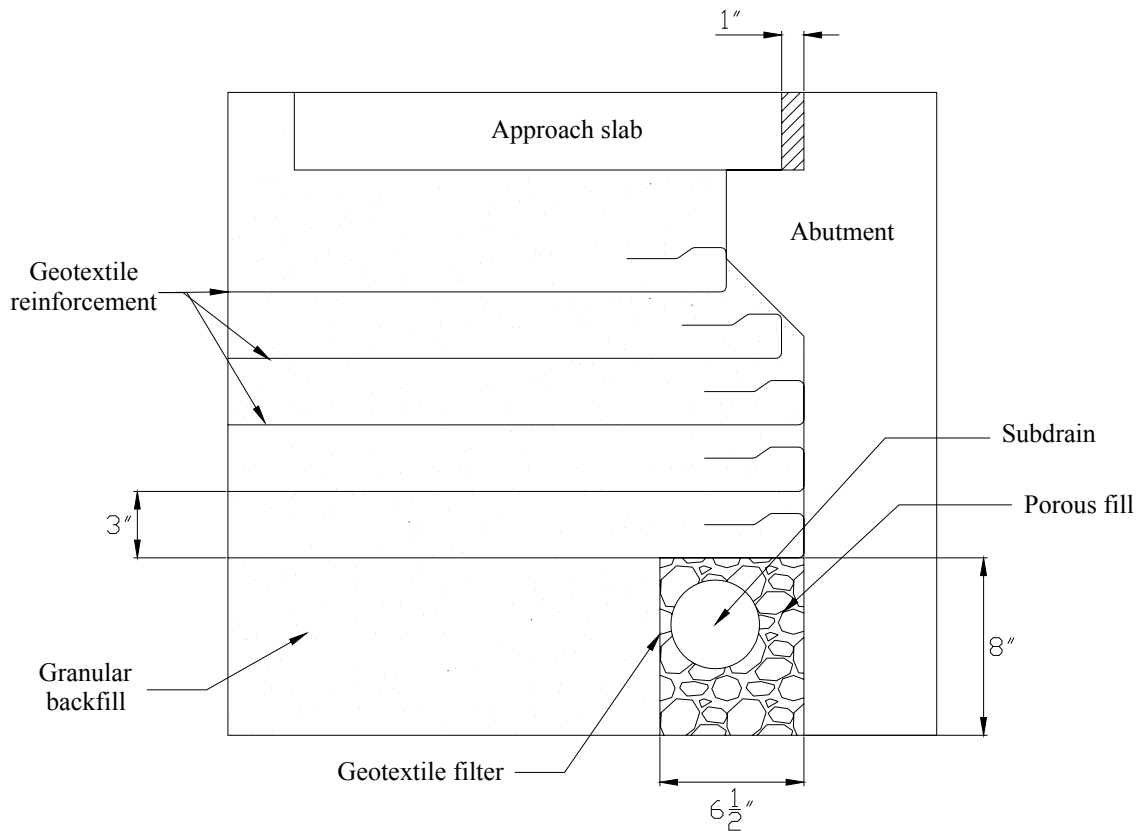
Schematic diagram of Test 6 with mechanically stabilized backfill behind the abutment and porous fill wrapped with geotextiles around the drainage pipe
